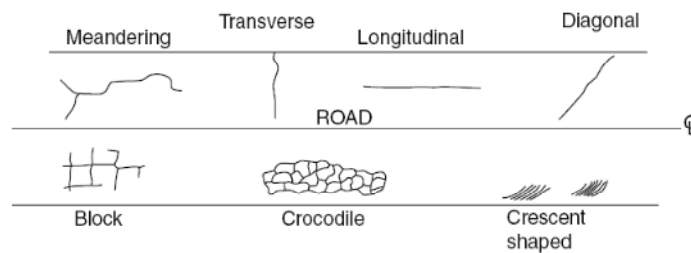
Sketch of common types of cracks in flexible pavements (Austroads, 1987).
